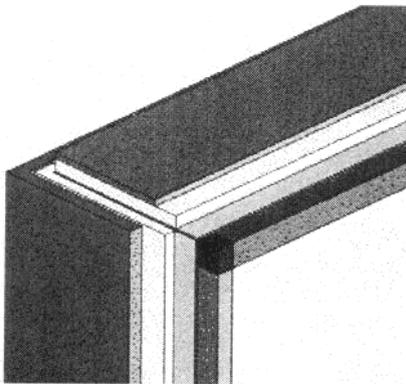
The sun/rainscreen, air barrier, insulation, air barrier, continuous support (membranes) design units of roof and wall enclosure (before the joint technology). Note that the wall and roof continuous support layers overlap at this stage.
